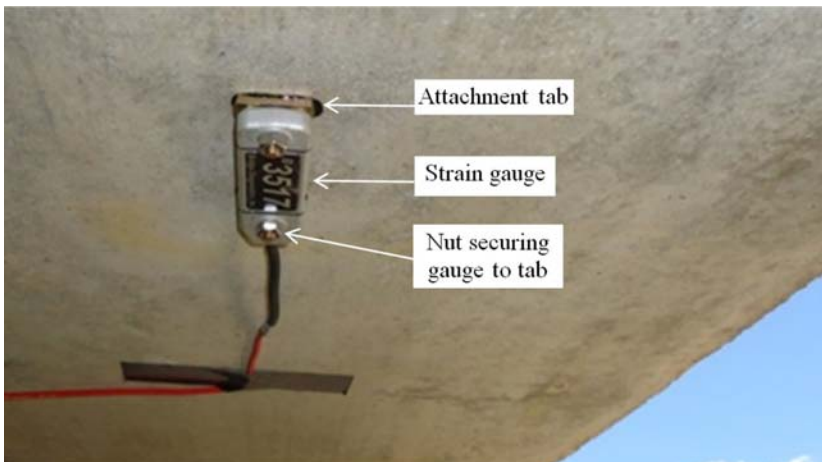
Strain gauge mounted to lower flange of PC bridge girder.
